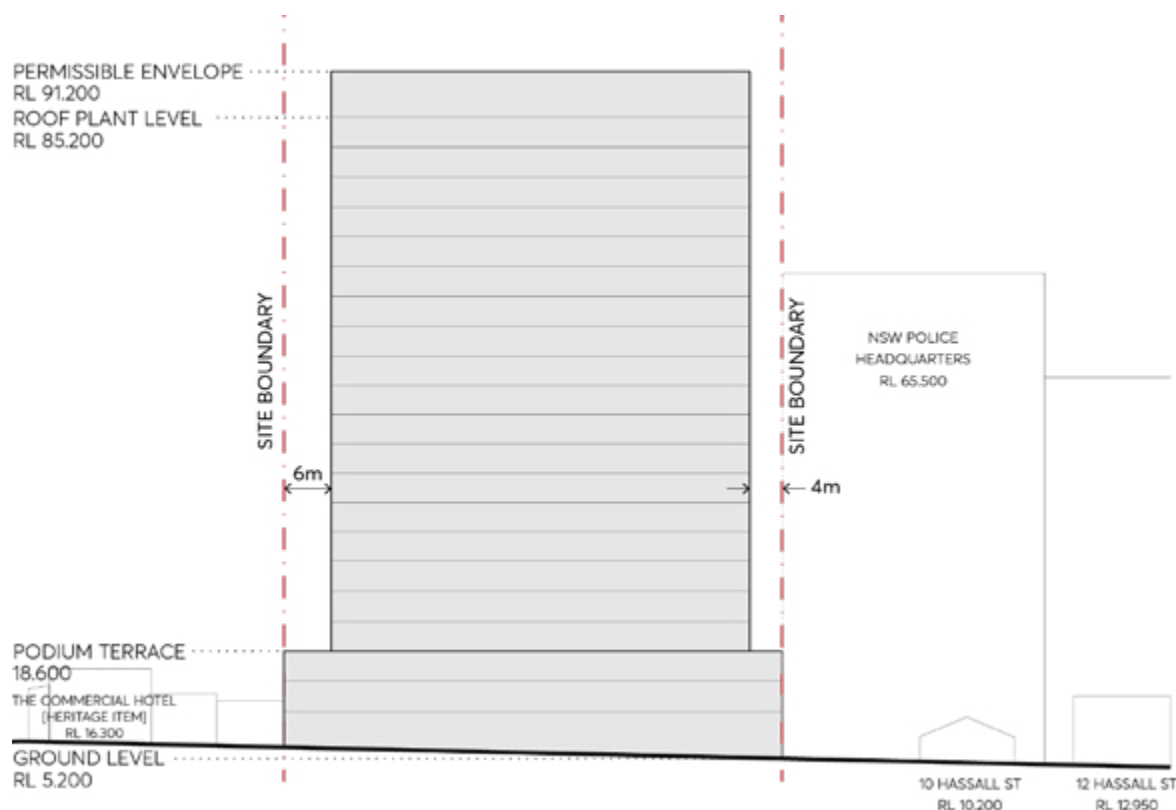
Hassall Street (southern) elevation illustrating the maximum building envelope
